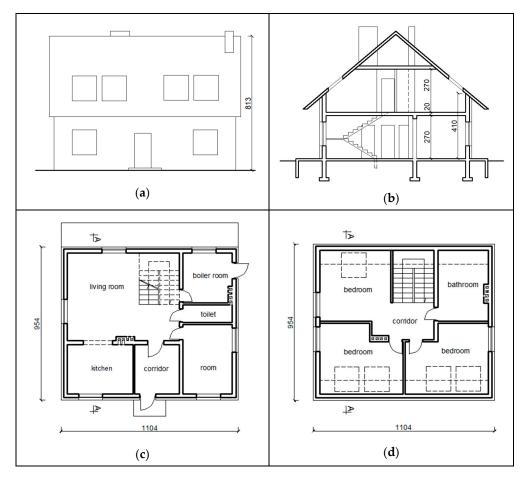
Scheme of the tested residential building: (a) front elevation; (b) vertical section; (c) ground floor plan; (d) plan of heated attic. The unit of measurement used is the centimeter (Own elaboration).
